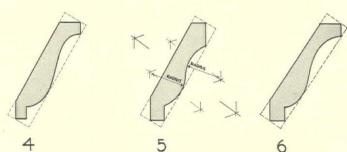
Drawing of crown moulding which convinced lumbermen that stock mouldings such as shown in Figure 5 could be well designed and led to the development of the stock moulding shown in Figure 6
